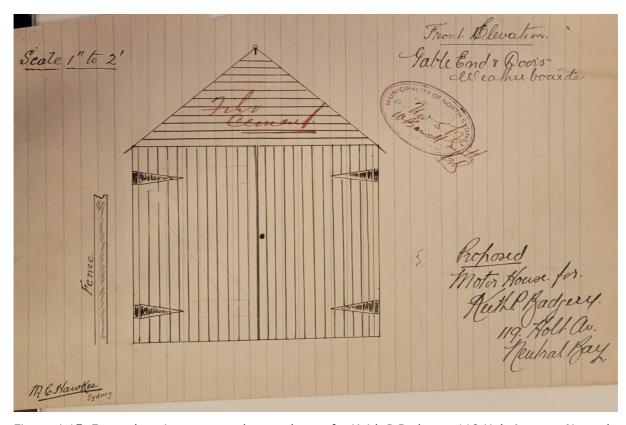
Front elevation, proposed motor house for Keith P Badgery, 119 Holt Avenue, Neutral Bay, 1927. (Source: NSMCA 91/5.? Folder B, 1927)
